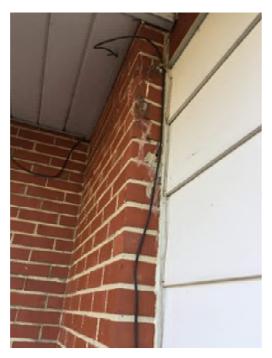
Significant deterioration of masonry veneer on building's west elevation.
